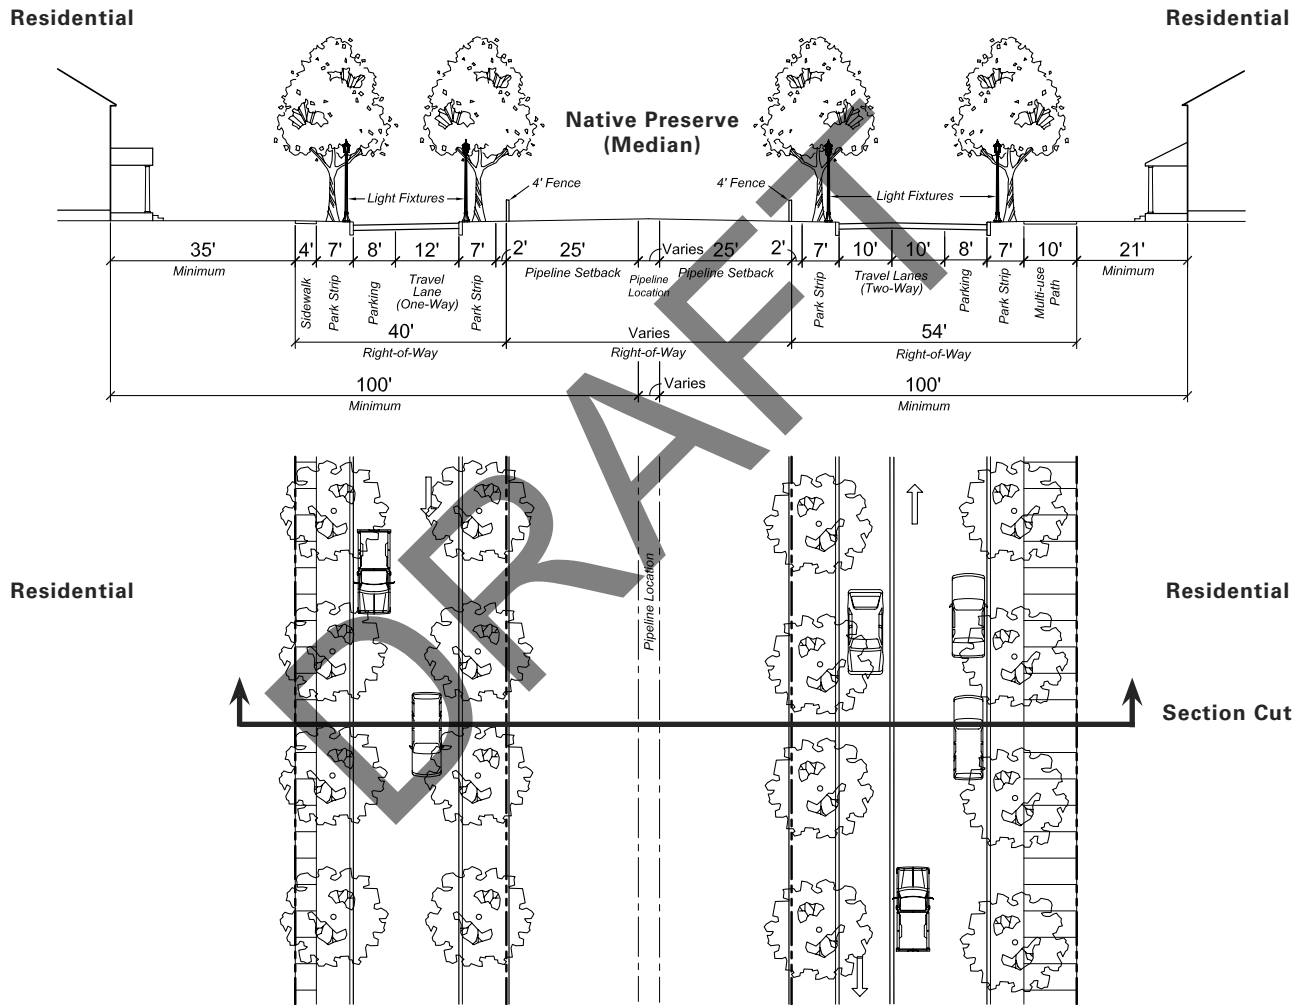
Proposed Section and Plan: Neighborhood Street G
